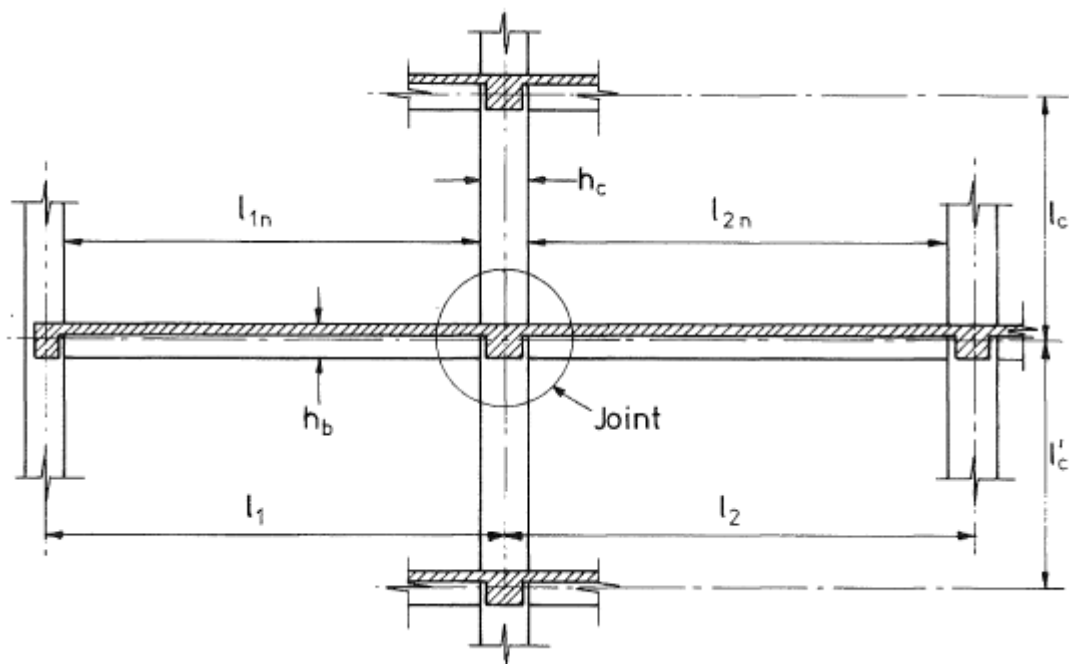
Interior Beam-Column Assemblage (Paulay and Priestley 1992)
